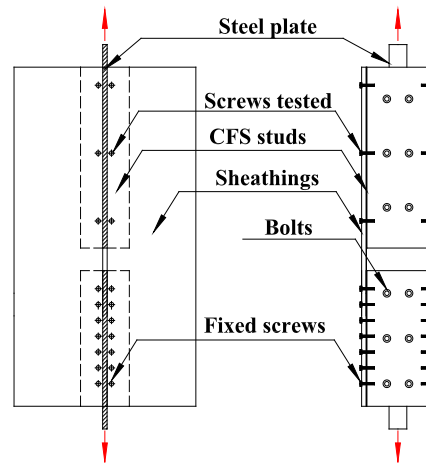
Test setup of connections achieving shear in screws parallel to edge
